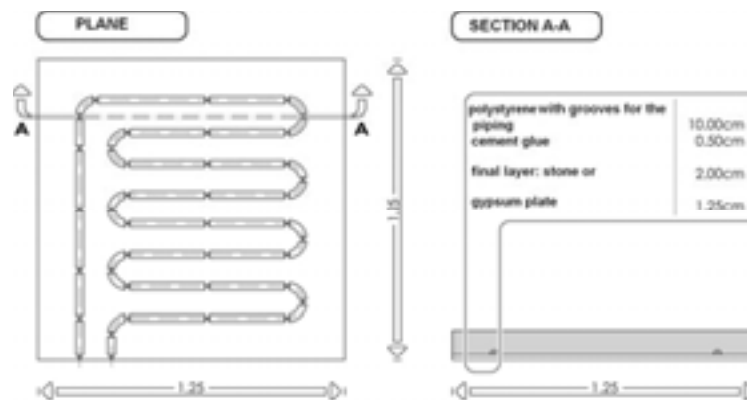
Plan and section of H/C ceiling panels. The plan shows the grooves for the piping
